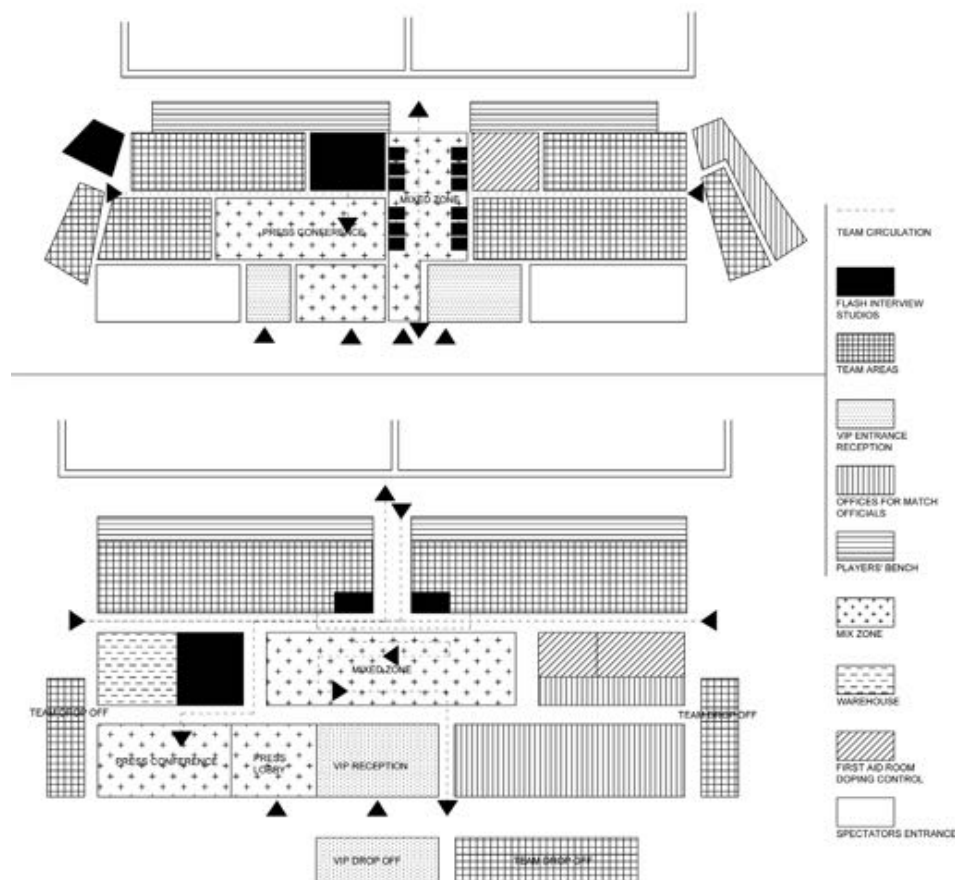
Konya Metropolitan Stadium team area plan (above) and schematic plan recommended by FIFA for team areas (below).
